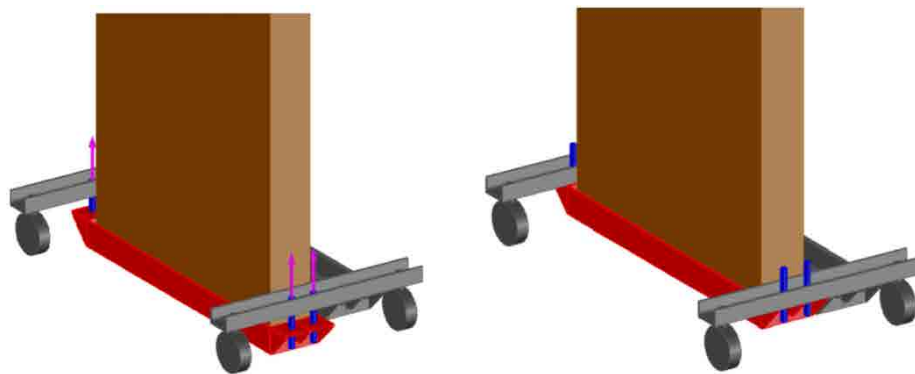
Elevation tool to enter walls W10 to W29 into the lab
